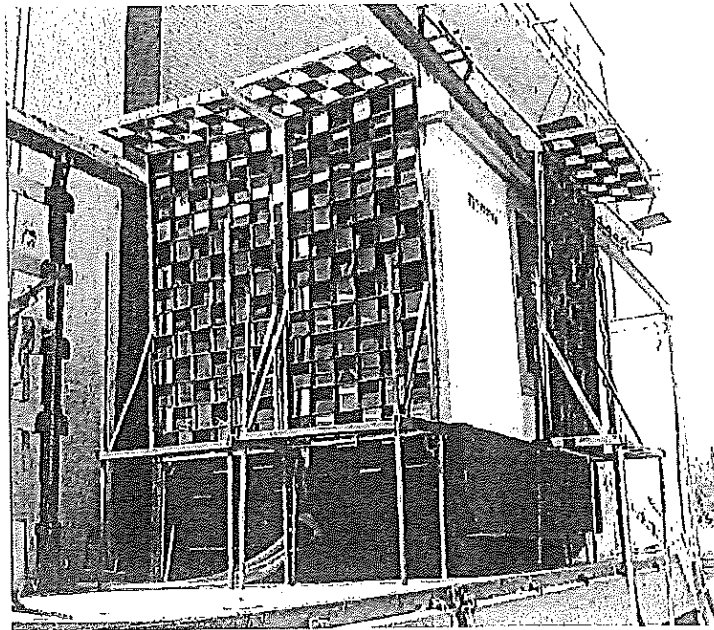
Aspect of 20/0.4 kV, 800 kVA Concrete Substation
